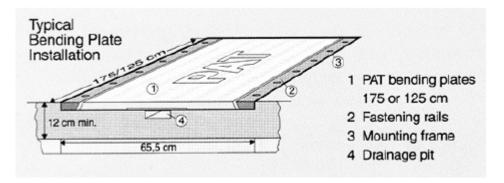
Bending plate layout (from PAT America, www.patamerica.com)
